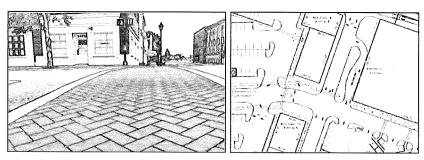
Pedestrian pathways intersecting with parking aisles, major drive aisles and access drives
